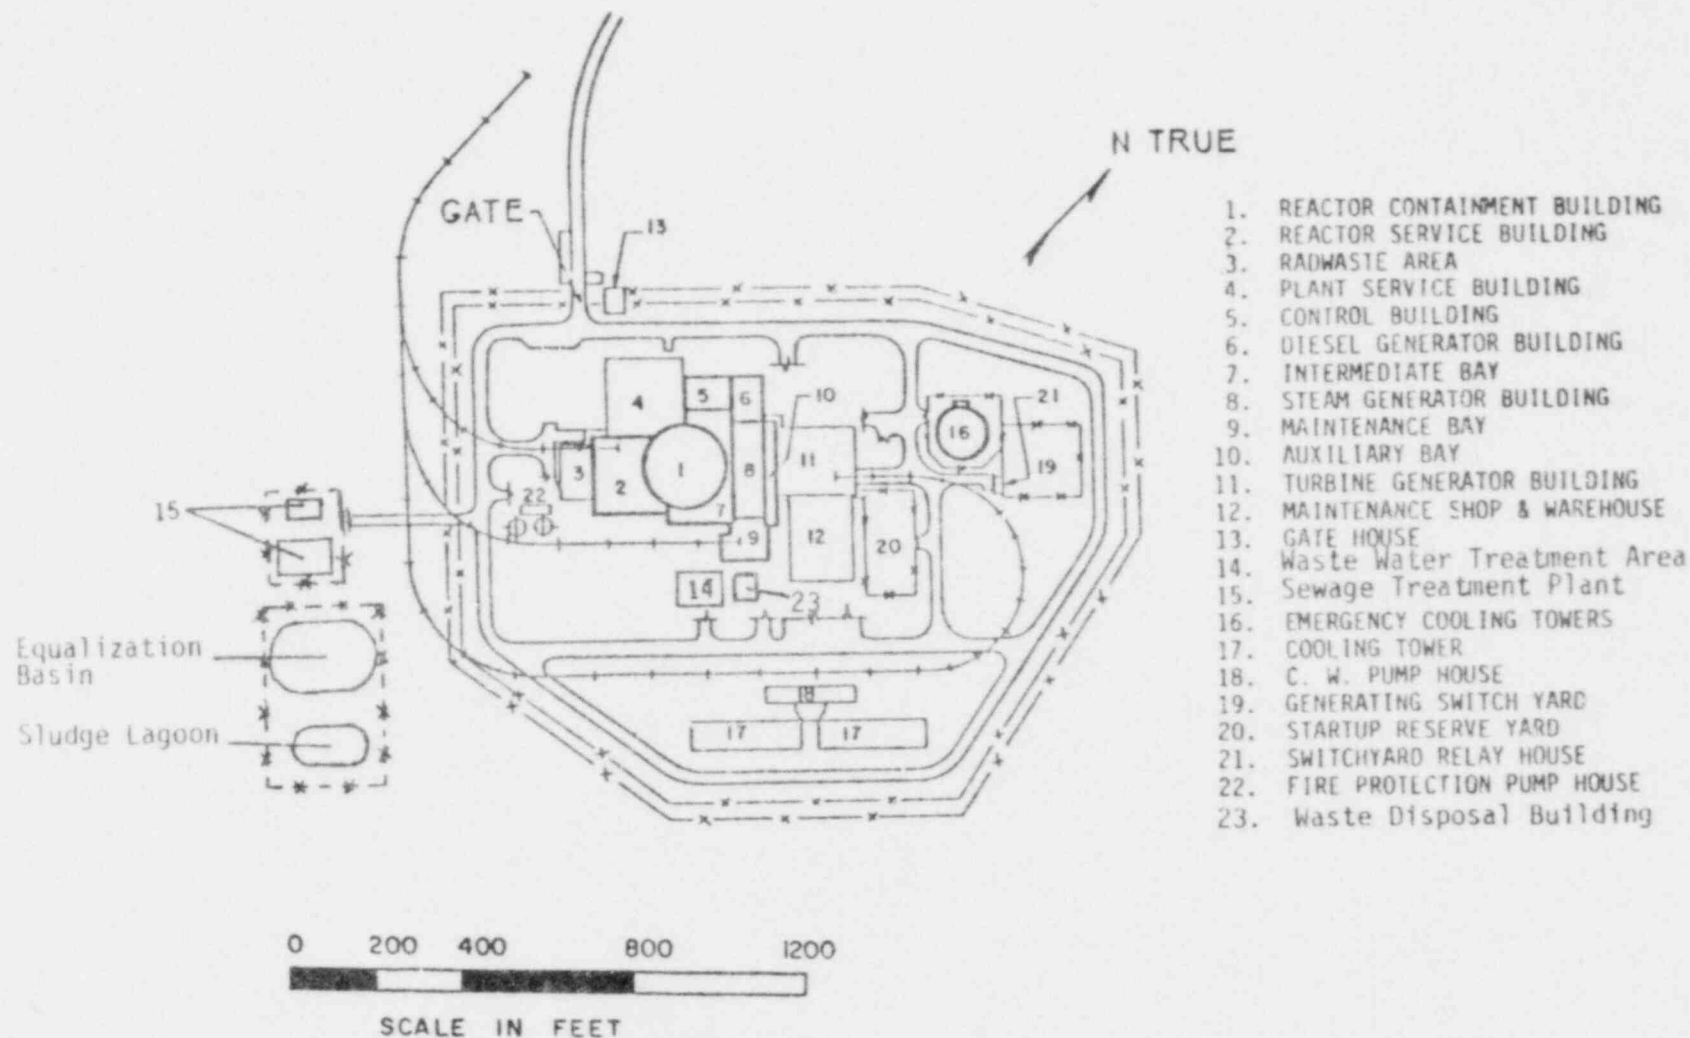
ARRANGEMENT OF PLANT STRUCTURES
